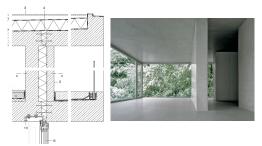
Terrace Detail, Dwelling Block in Zurich [13]
